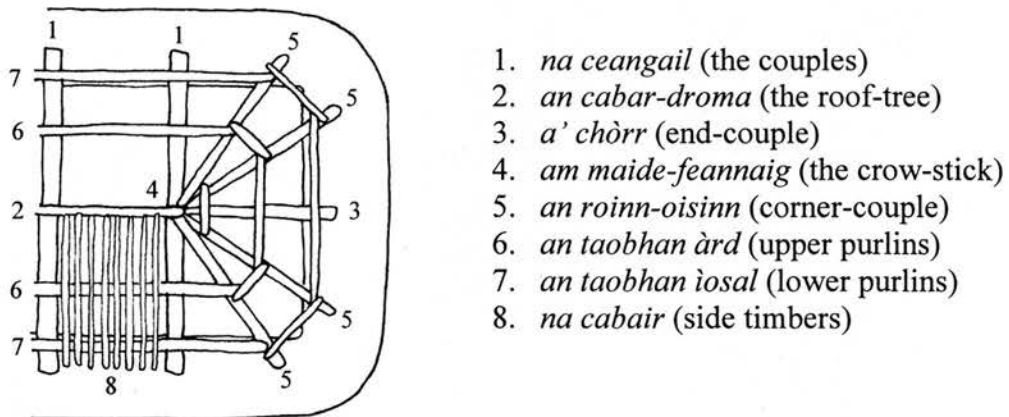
Plan of roof timbers (after Fenton 1995: 9) (not to scale)
